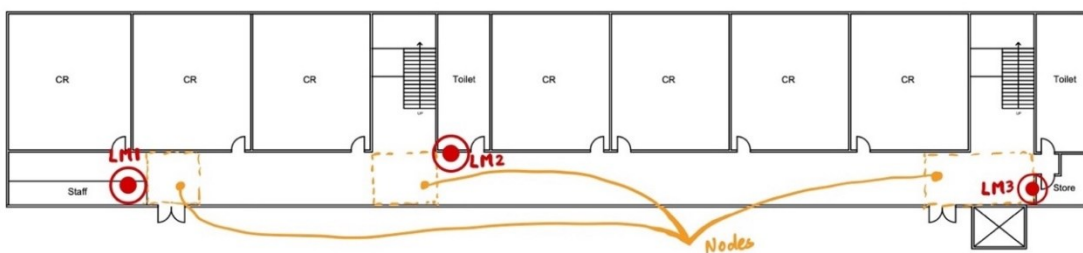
Floor plan of building 1 indicating the location of the landmarks (Source: Author).
